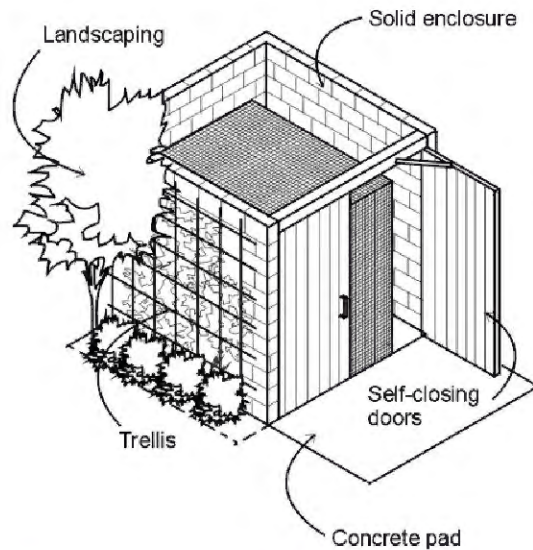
B.6.2-1. Examples of acceptable dumpster enclosures.
